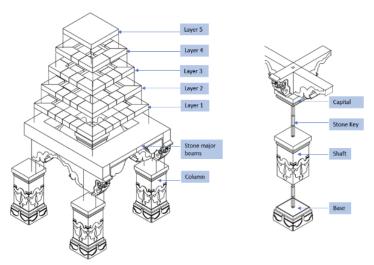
Exploded construction drawing of the colonnaded chamber showing stone assembly and sequential construction order. (Developed by author)
